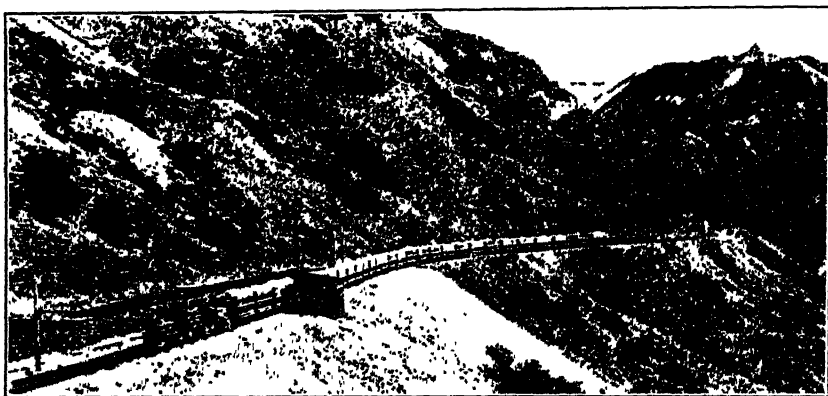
A 300-TON TRAIN ON 20-IN. GAGE, SHOWING TRIPLE-HEAD LOCOMOTIVE.
